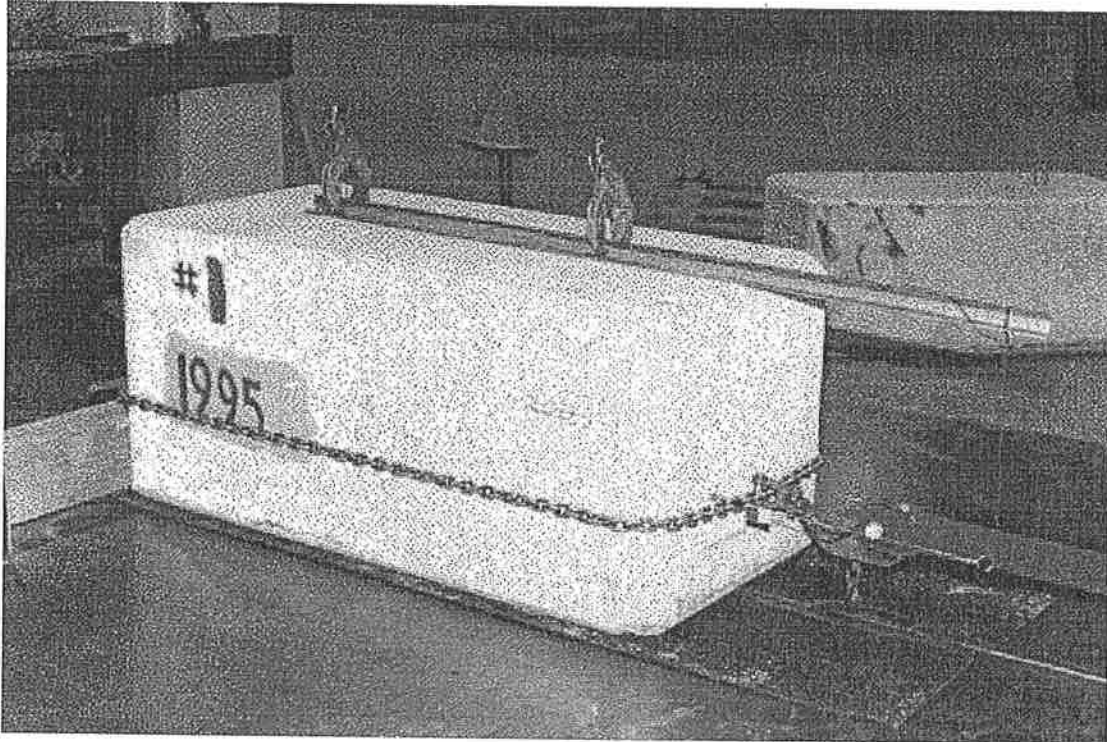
/ Concrete Block on Steel Deck with Rubber Mat Interface
